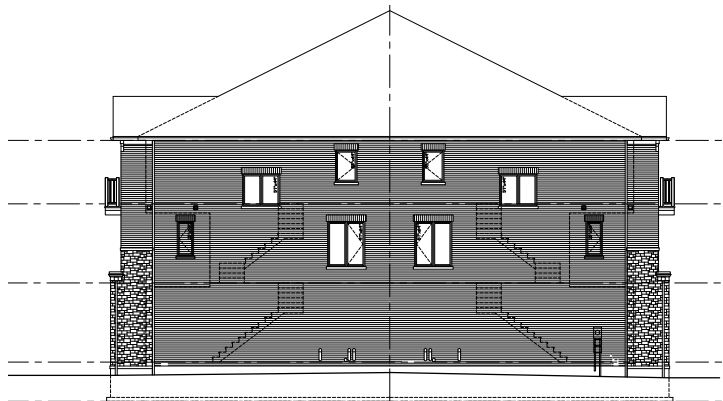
Back-to-back Townhouse Interior Side Yard Elevation
